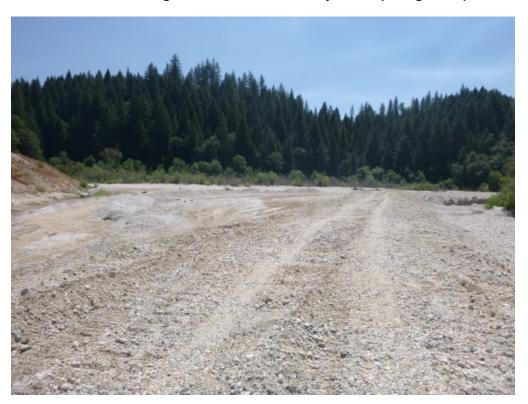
Staging Area 2 (SA-2) (facing south).
